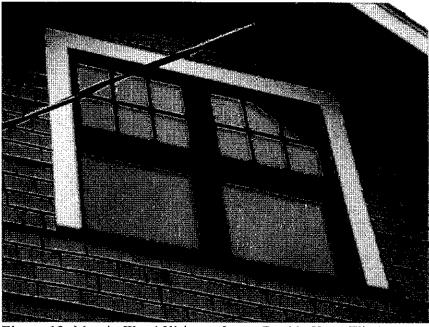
Marvin Wood Ultimate Insert Double Hung Windows to be used on the north, south, and west elevation (this window installed at 1003-05 North 33rd Street).
